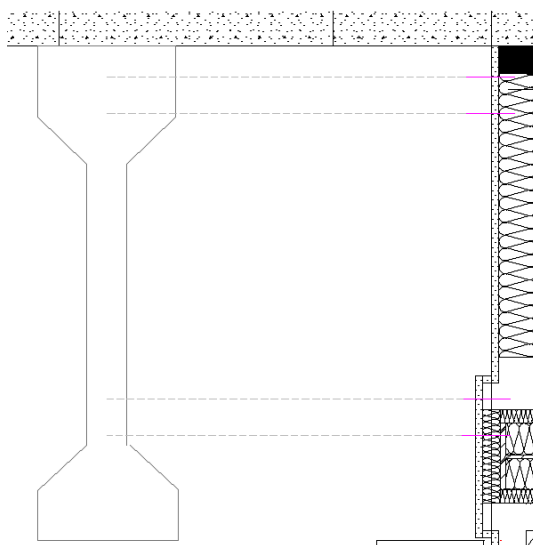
Sketch showing that the bottom plate would coincide with the web of the prestressed beam (85 mm)
